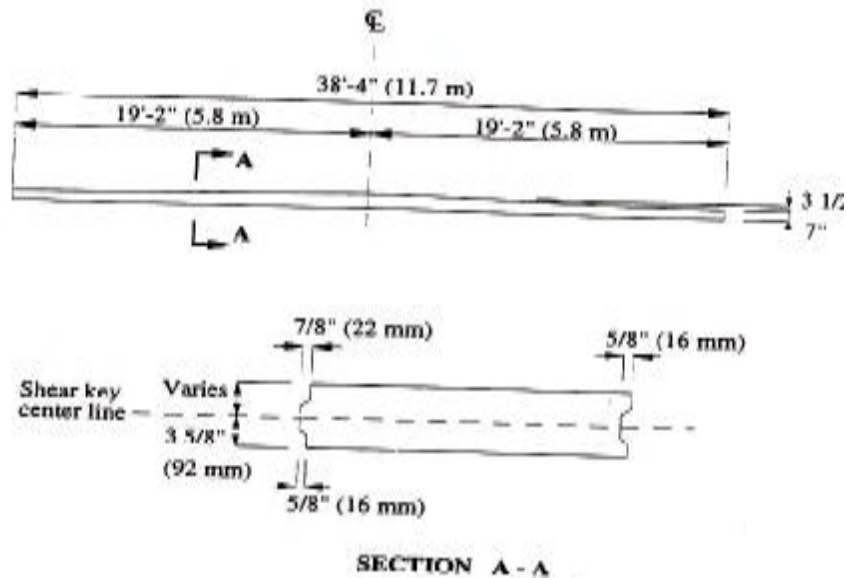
Elevation and shear key details for Knightstown Bridge
